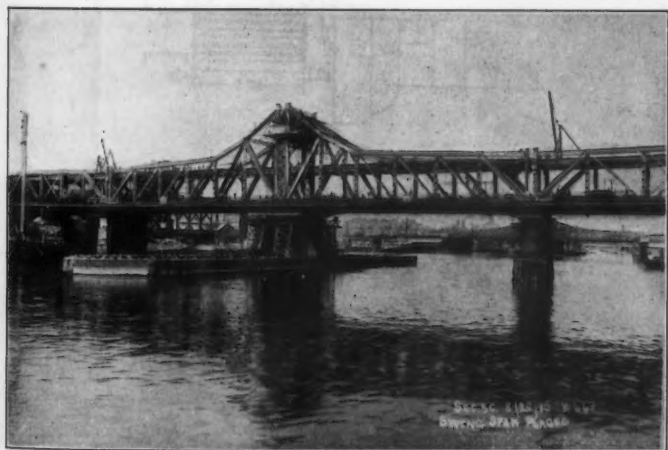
HARLEM RIVER BRIDGE. NEW SWING SPAN.
